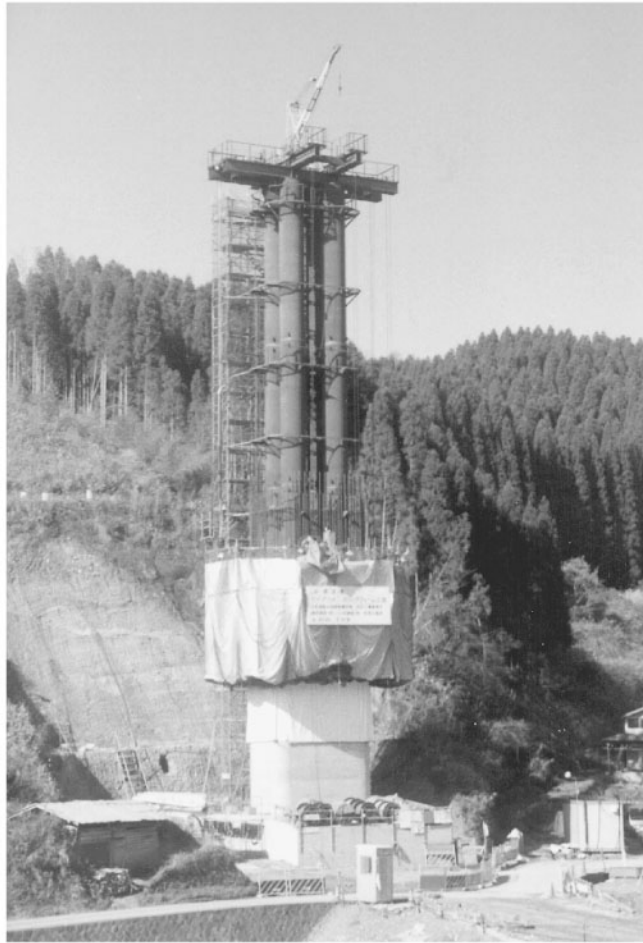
Piers of Shigehara Bridge. (Courtesy of Japan Highway Public Corporation.)
